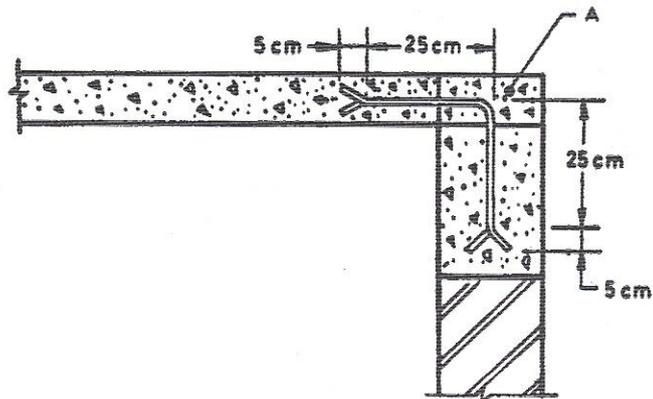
Anchoring of RCC Slab with Masonry Wall
